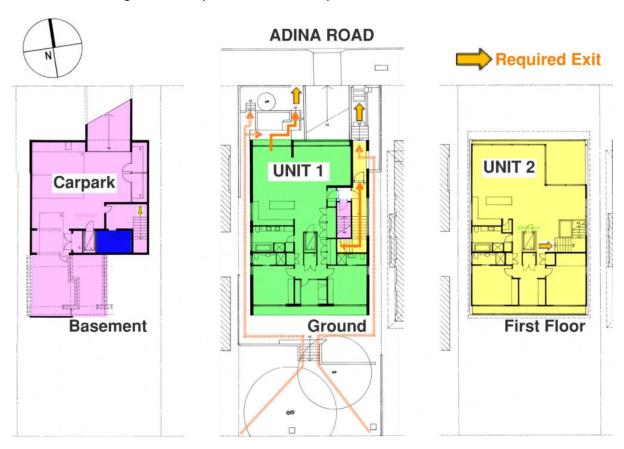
| Floor Plans of the proposed development | Source: Garcia Negrette Architecture & Design
